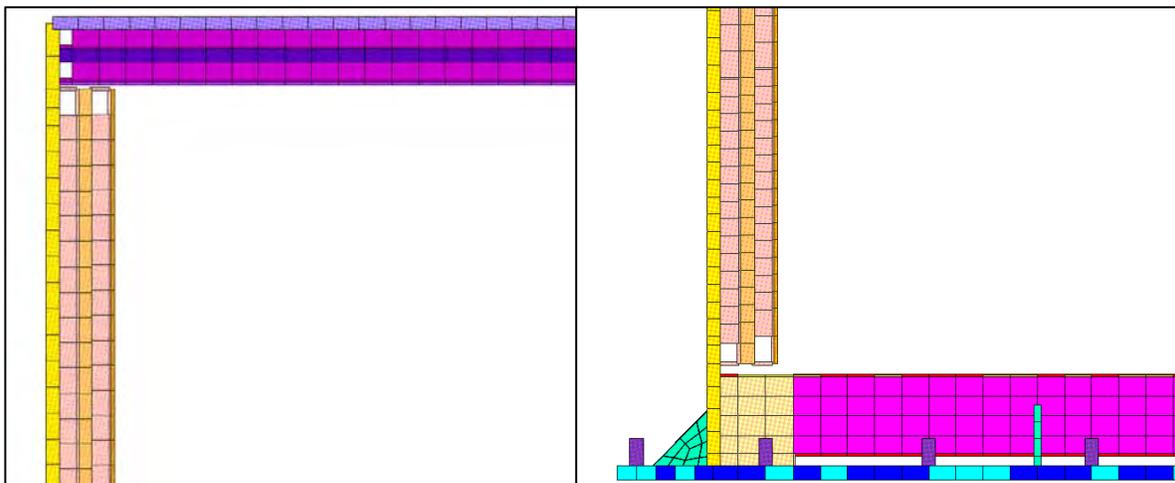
(left) Horizontal section through BBCB modeled wall joint, (right). Vertical section through BBCB wall and floor joint.
